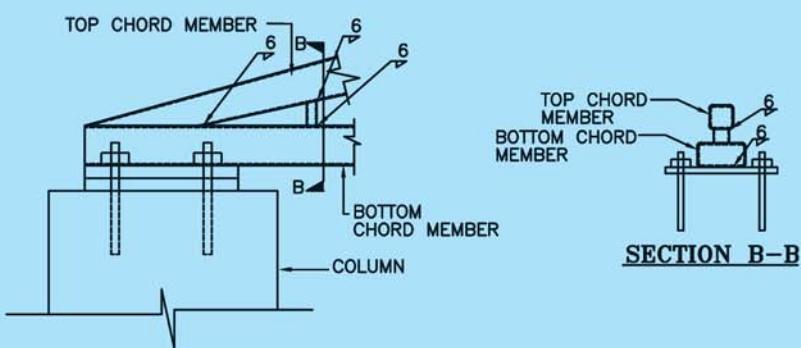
DETAIL OF ROLLER SUPPORT FOR TRUSS
